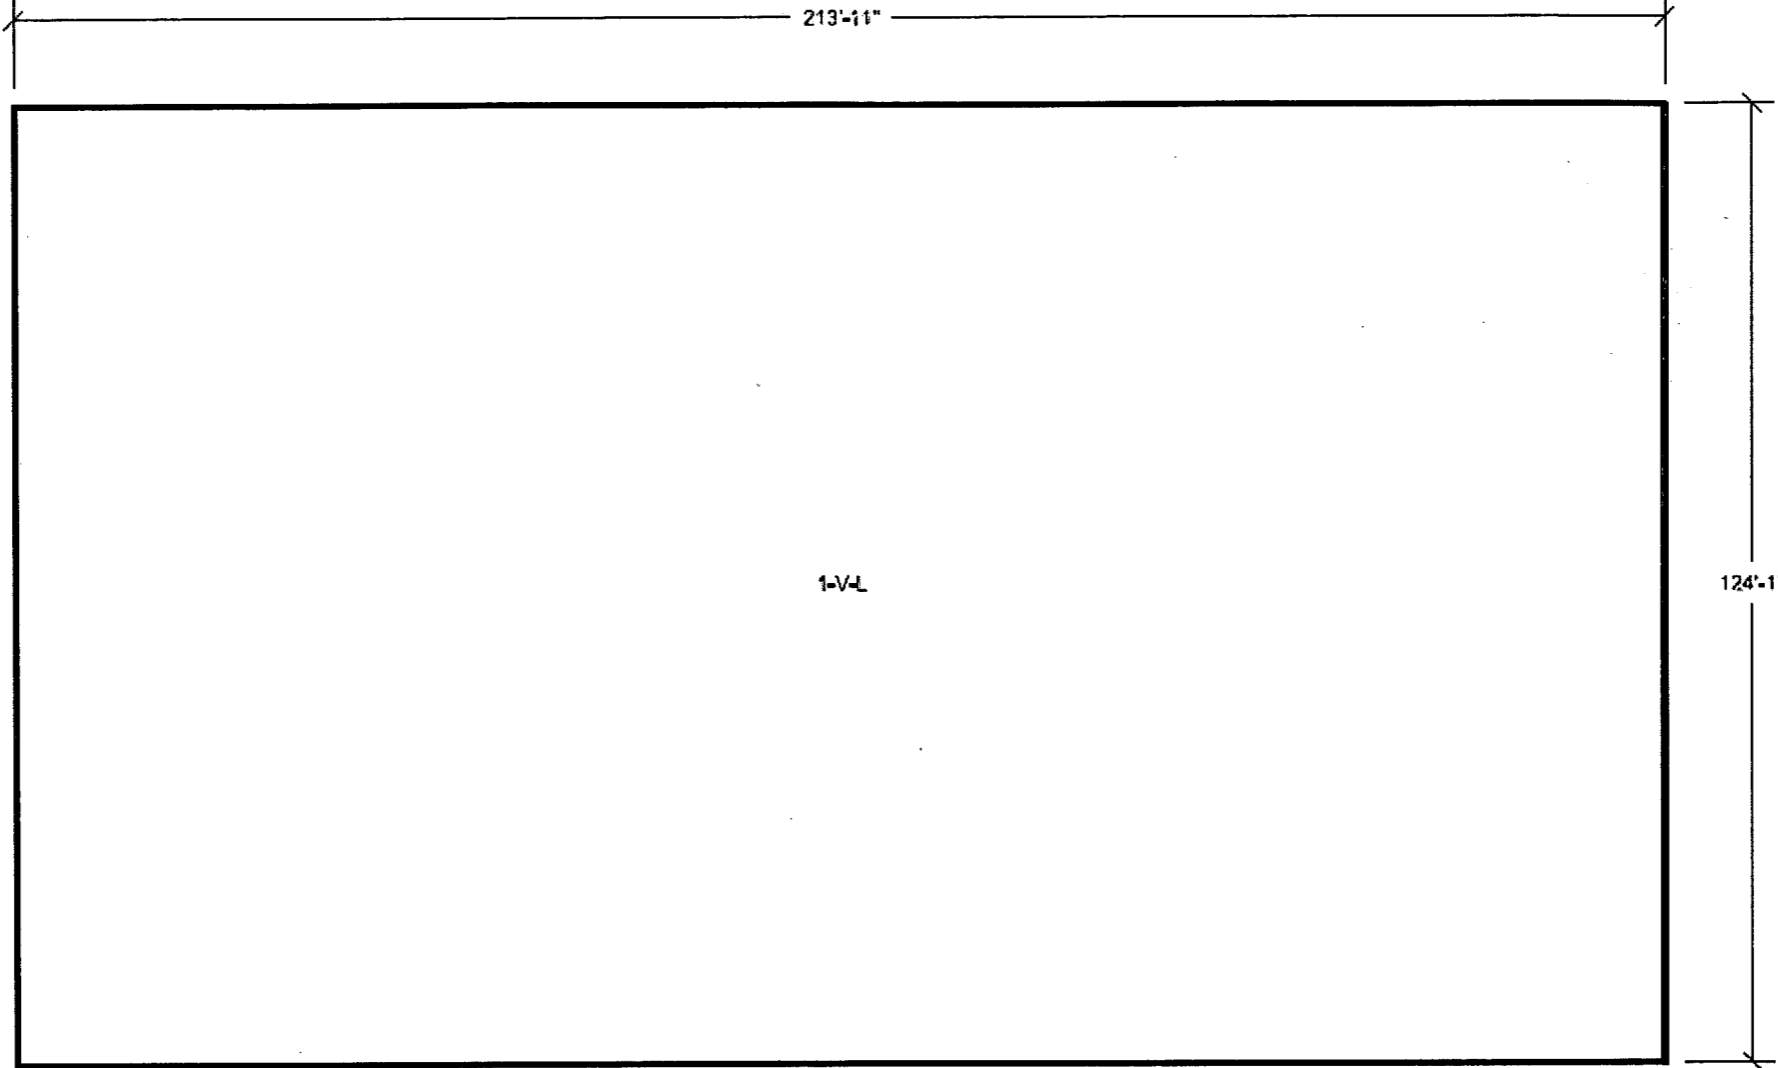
H, 3-39: ELEVATION 95 LOOKING DOWN
